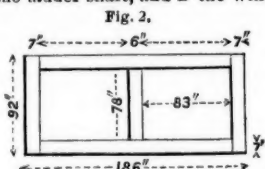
represents the Skalley pit, No. 1, at the Duttweiler Colliery, near Saarbrücken. Both divisions are used for winding, one cage in each division carrying two cages, holding 10 cwt. each.
